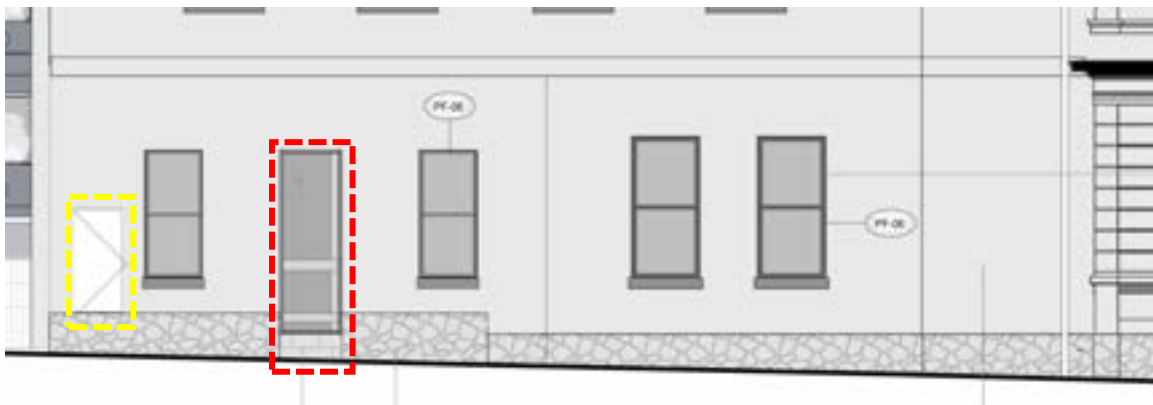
A3-203 Proposed north façade of the Victorian building, note the reconstructed double-hung sash windows, and a new fixed glazed panel in between (outlined in red). An electrical panel is located at the eastern end (outlined in yellow). Source: Trethowan Architecture, 2025.
